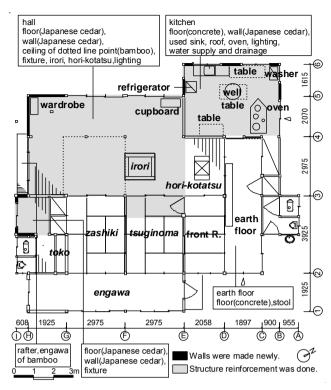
Floor plan after a repair and repair contents about interior and facilities
